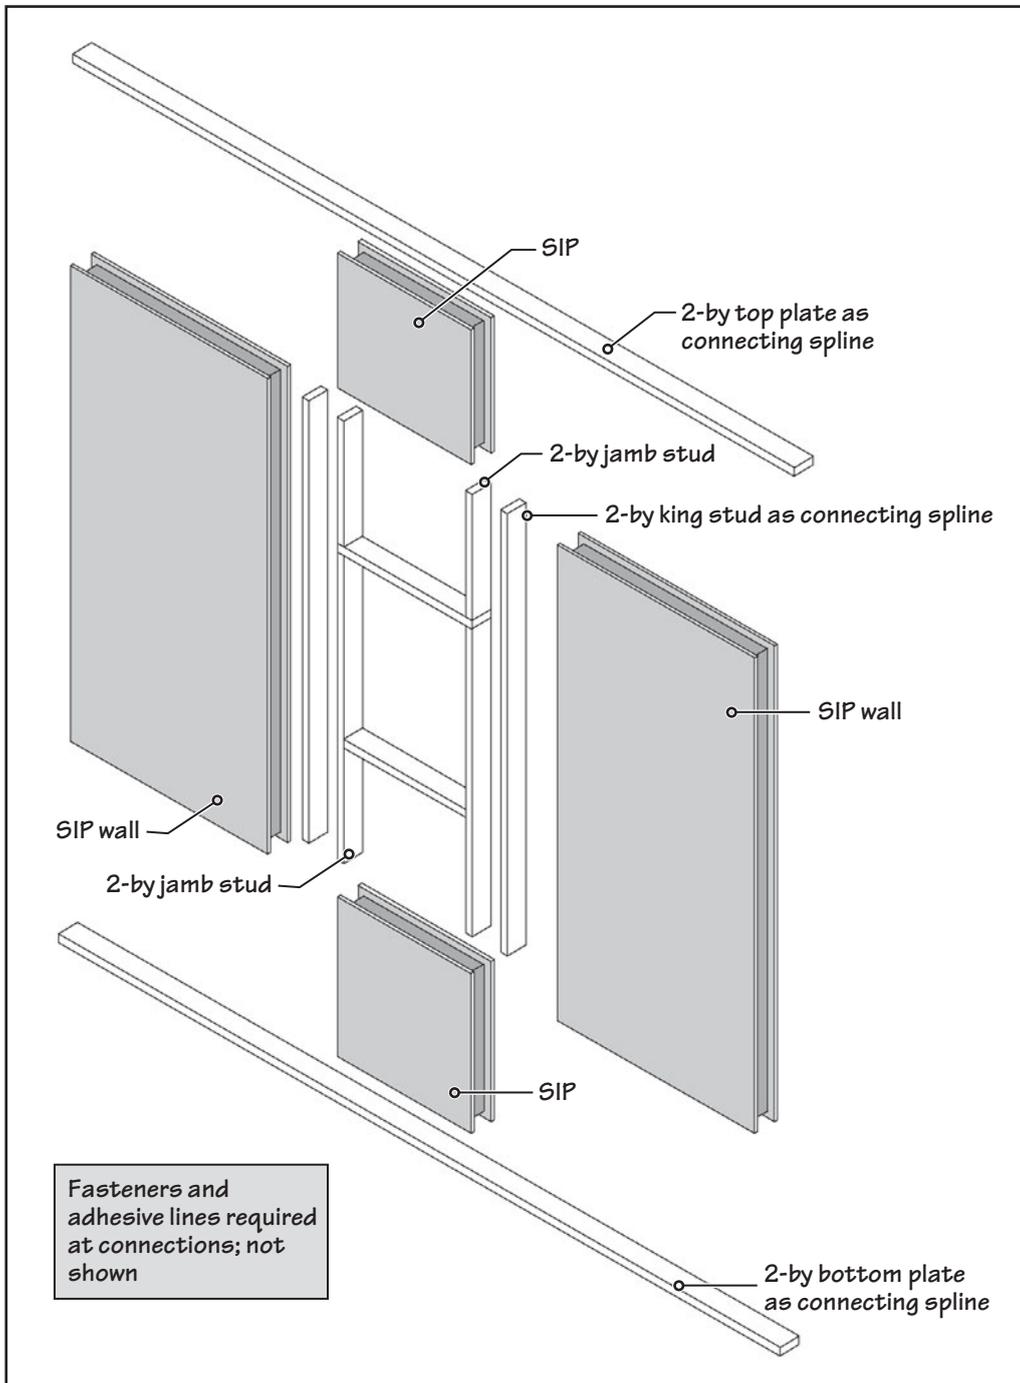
A typical detail of framing around a window. Framing around a door is similar.
